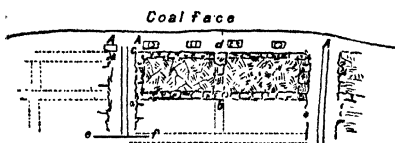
PLAN OF PILLARING ON LONGWALL FACE.
